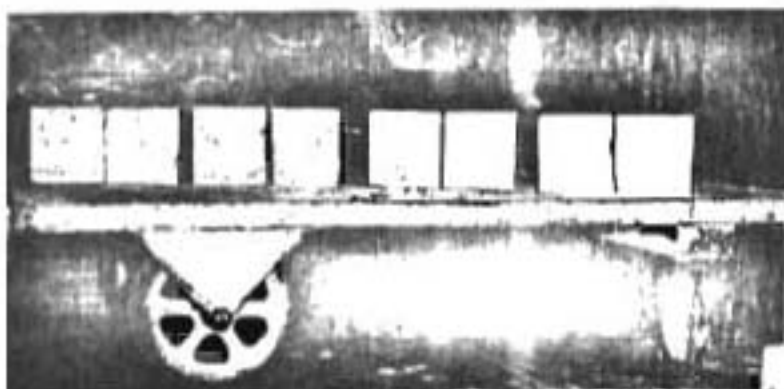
Typical specimens in sequence of water penetration test.
